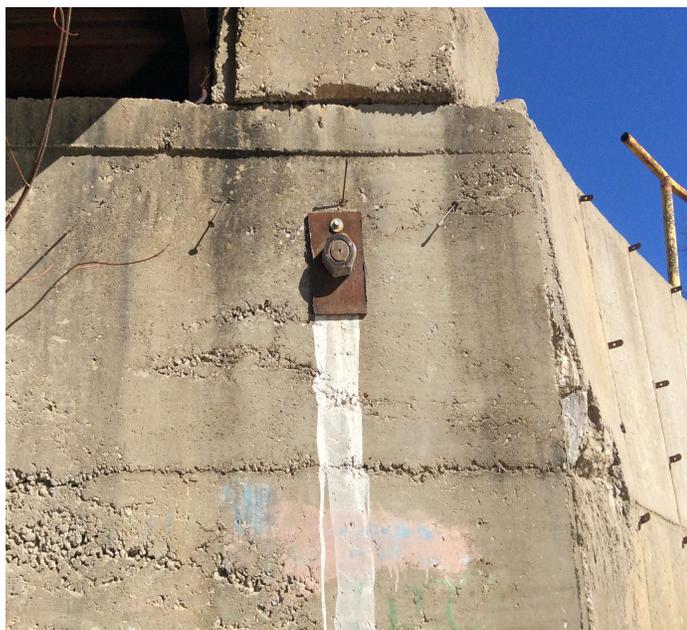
Description Abutment #2, right side-Anchor to prevent further rotation.
